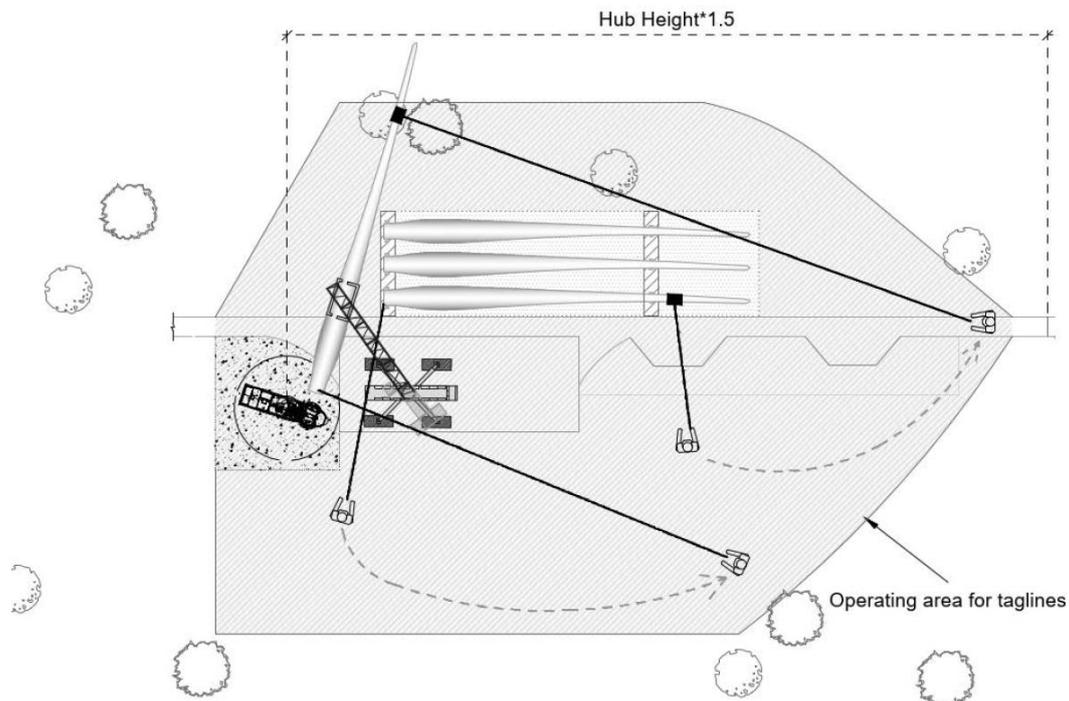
Indicative drawing of area requirements for the use of tag lines with single blade installation method
